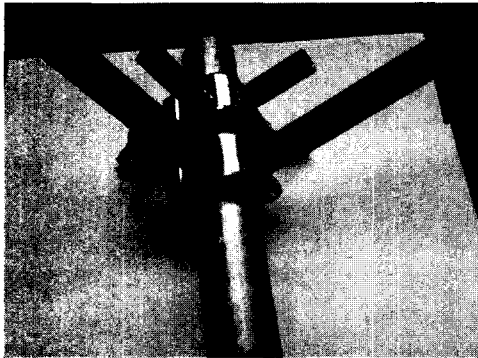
Multi span insertion joint for a pipe framed greenhouse
